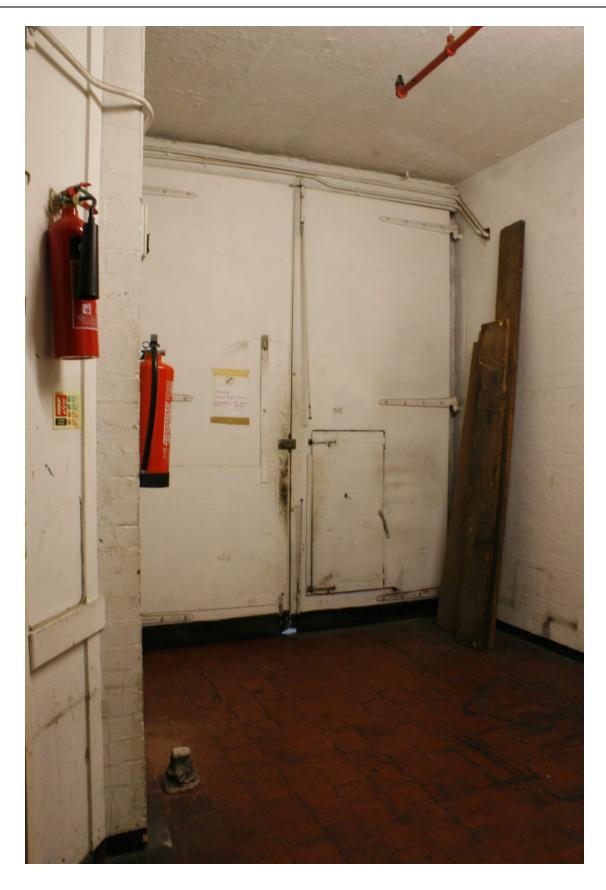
Double door with cast iron strap hinges stamped Charles Collinge of Lambeth, looking south (72FmLa D100 043)
